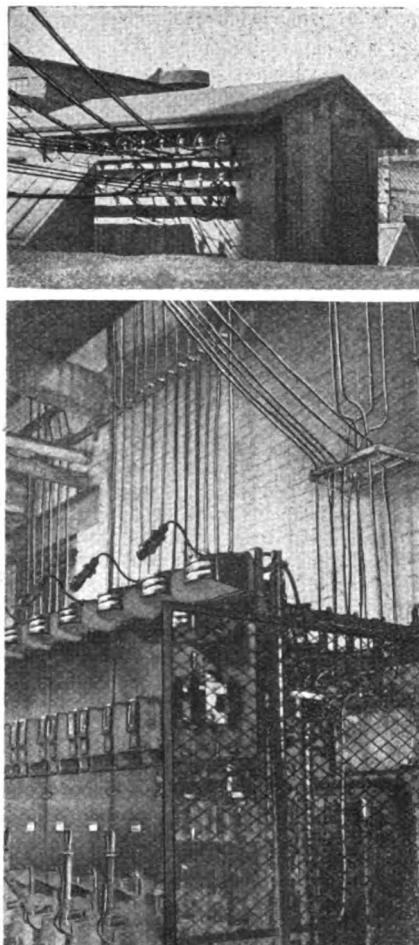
Wire tower on roof of large industrial plant and, below, method of running feeders from switchboard to tower.
